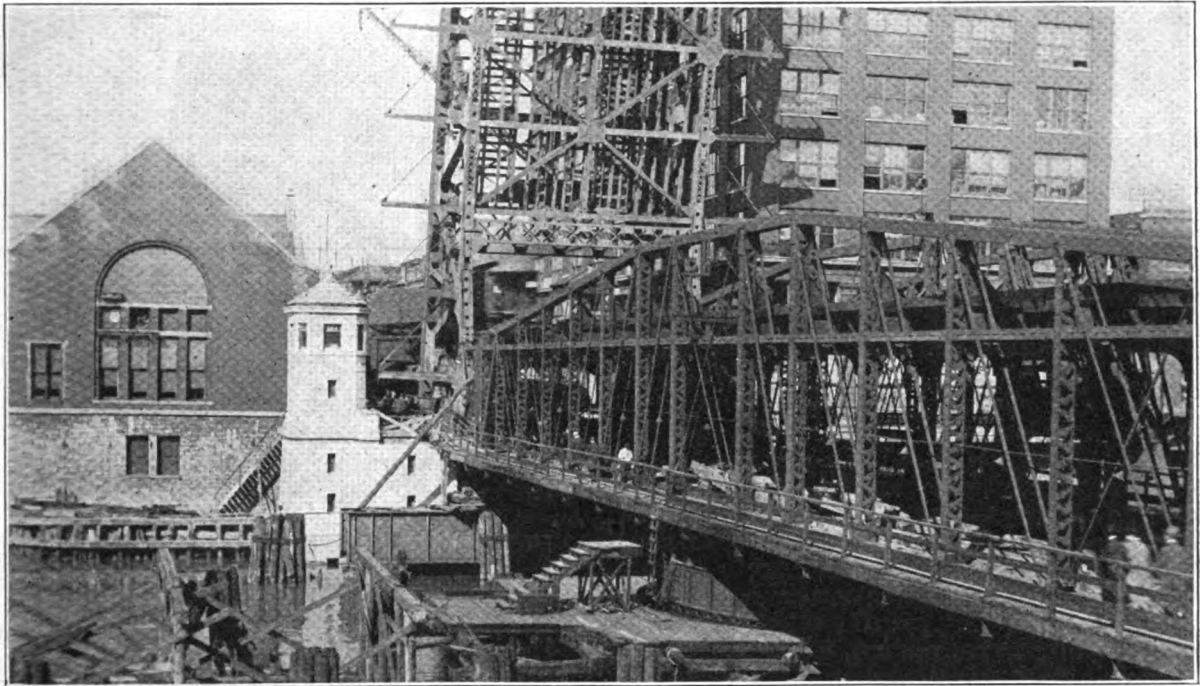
View of Old Steam Operated Swing Bridge at Wells Street, Chicago, Showing North Leaf of New Bascule Bridge Being Erected Without Interruption of Elevated Railway Traffic Over Old Structure.
